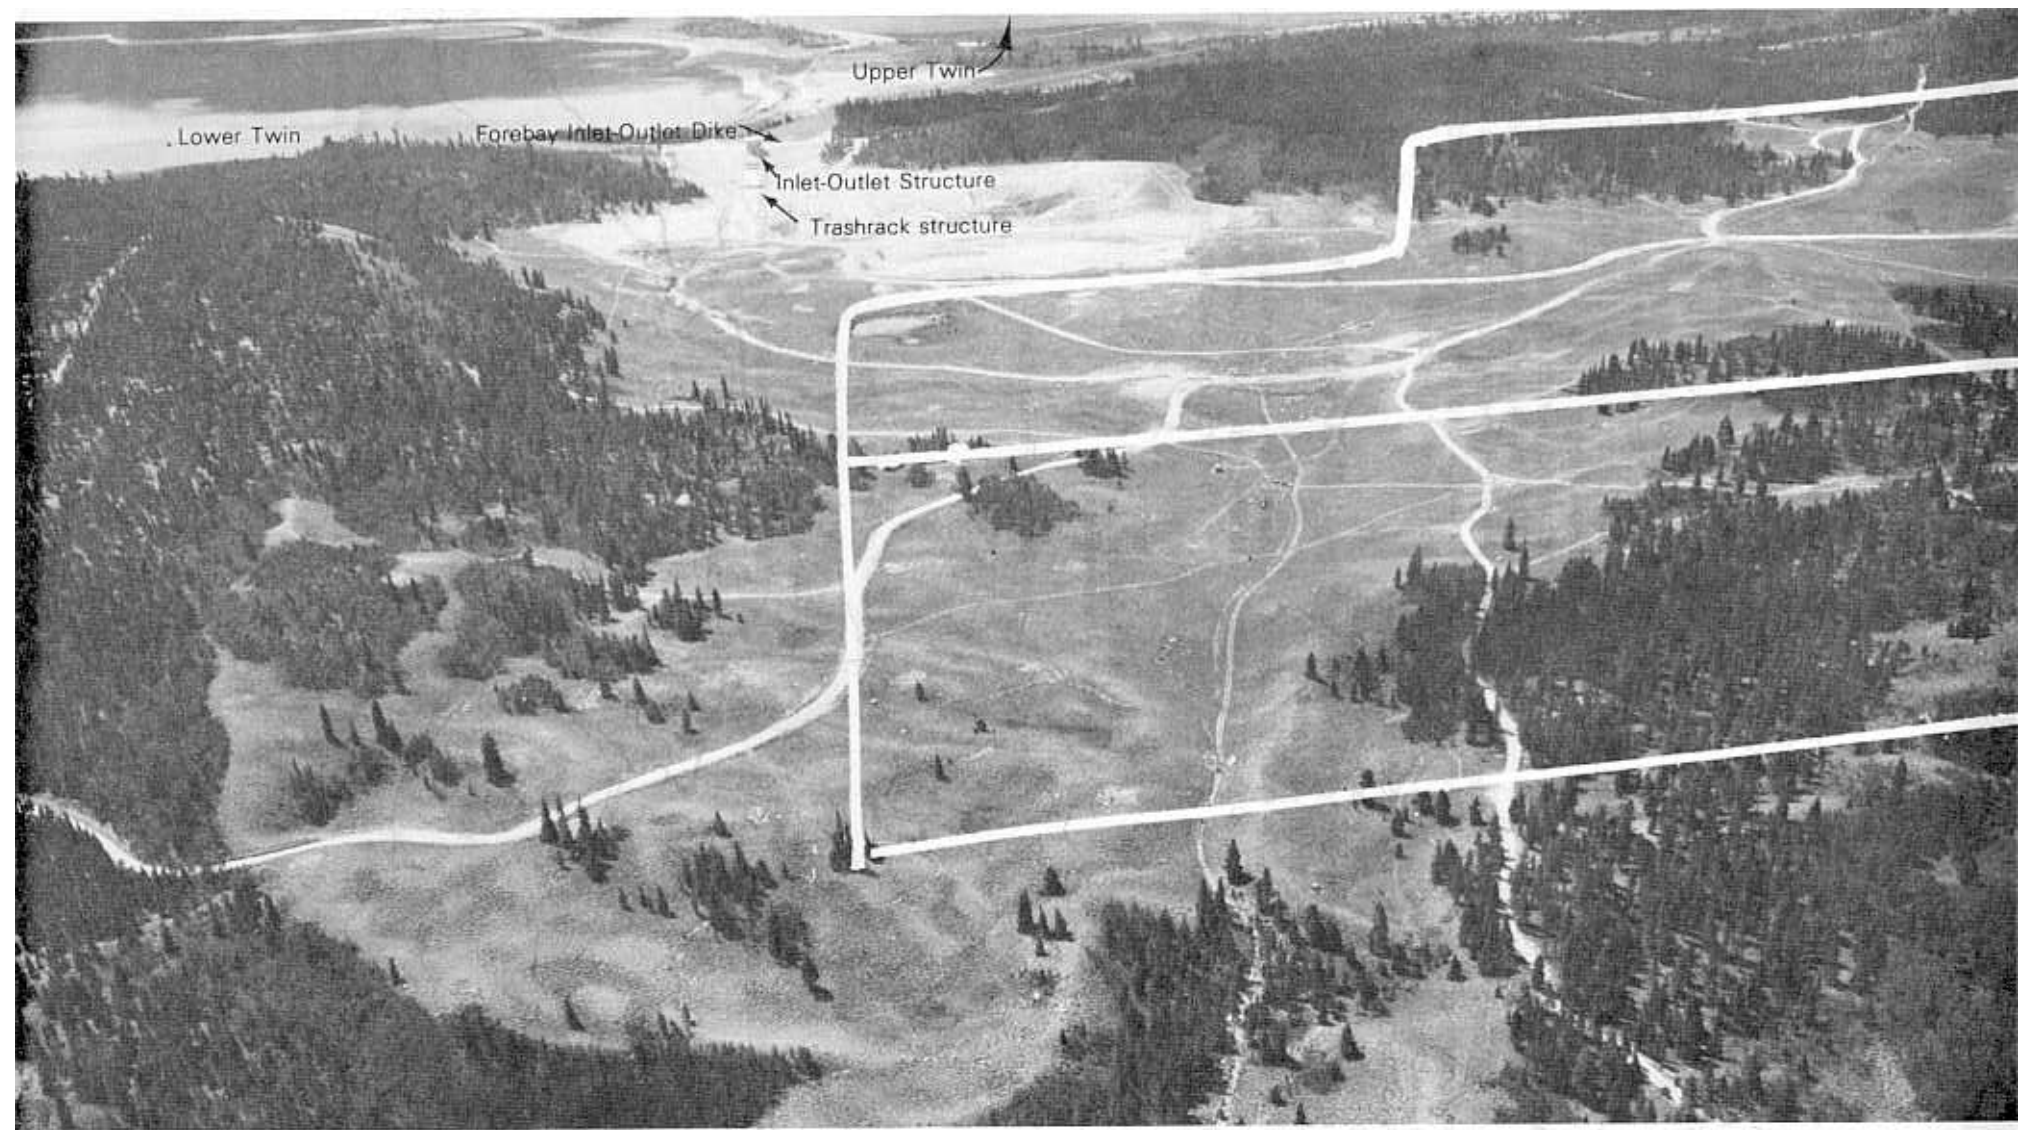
Mt. Elbert Forebay Dam site before construction. Garner and Hallenbeck mining claims are indicated by white perimeters August 14, 1975.
